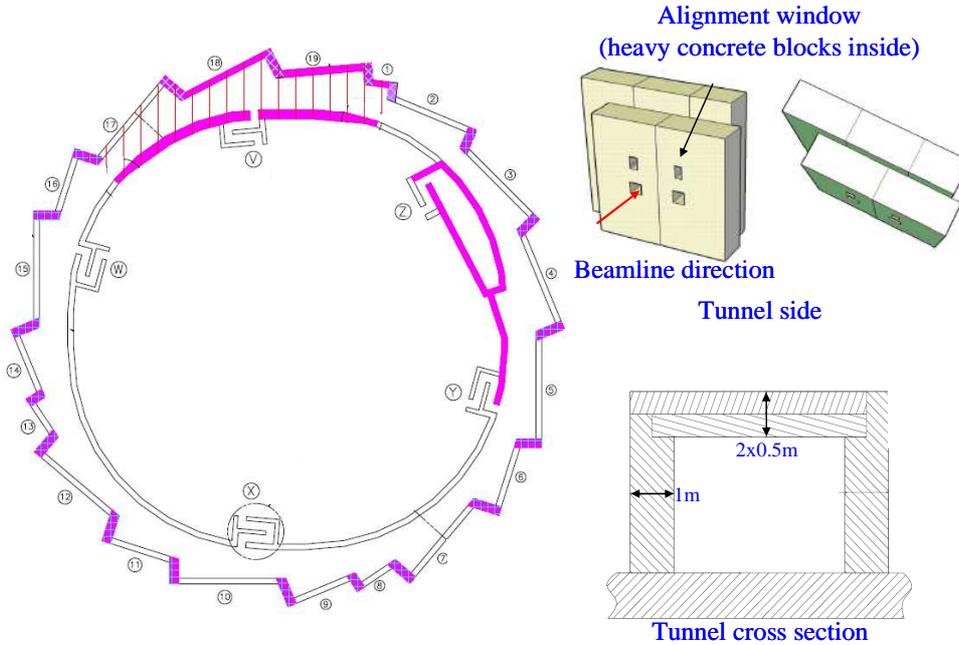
Different views for the ALBA shielding elements. On the left side, a layout of the shielding walls (in pink colored is marked the heavy concrete zones), and the slashes area is for 3 layers beam roof structure at the injection zone. On the top right side, a detailed view of a front wall for 2 beamlines (2 layers block configuration), and on the bottom right side a tunnel cross section detail, where a 2 layers beams for the roof structure is shown.
